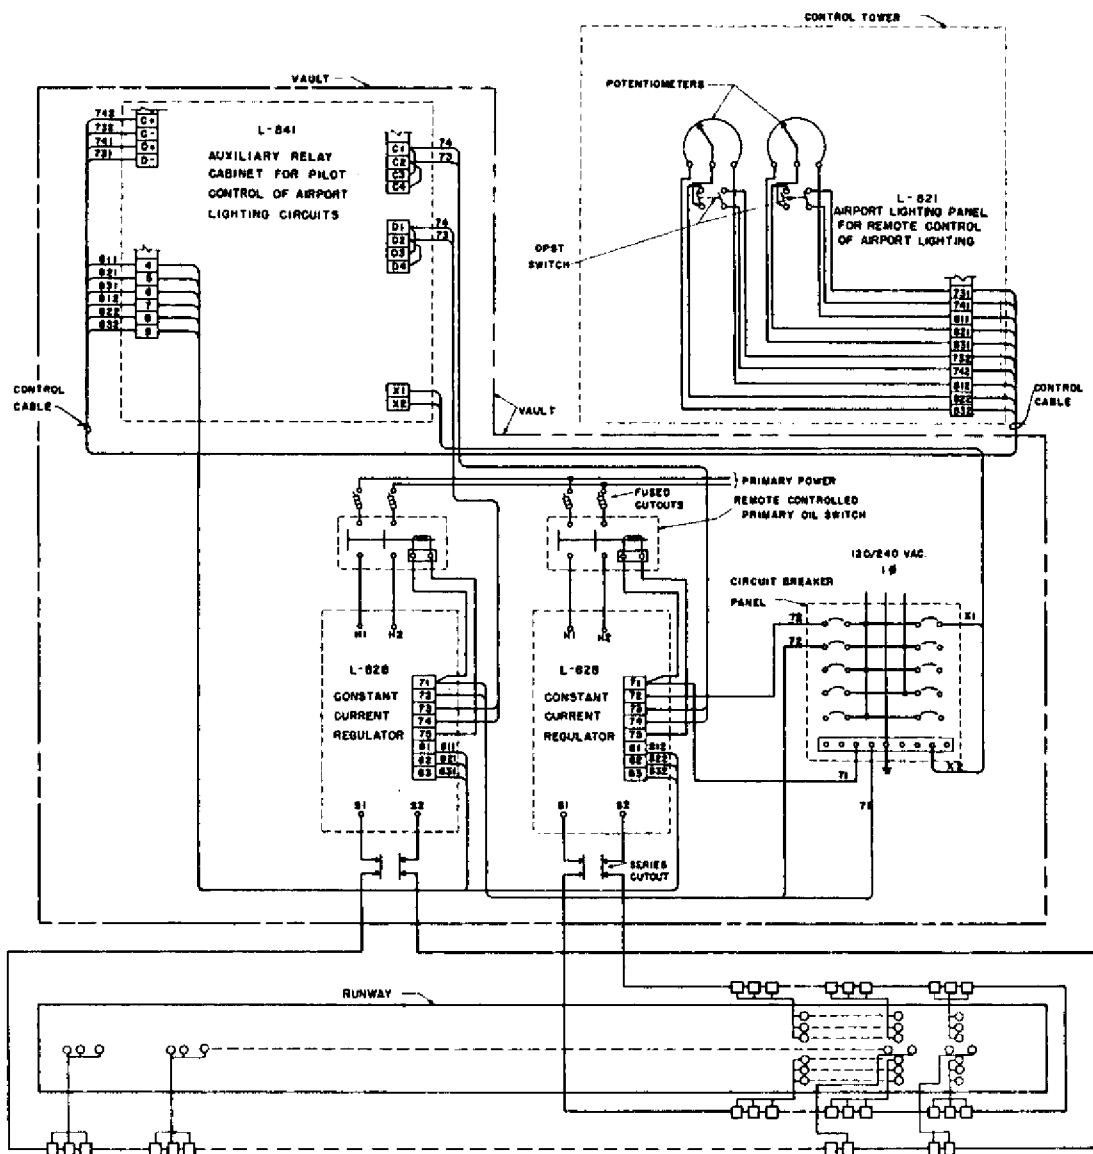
TOUCHDOWN ZONE LIGHTING LAYOUT
